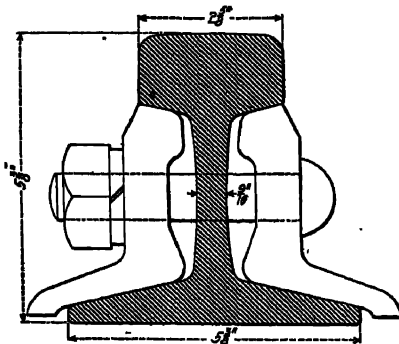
American rail, 90 lb to the yard, showing rail joint.
